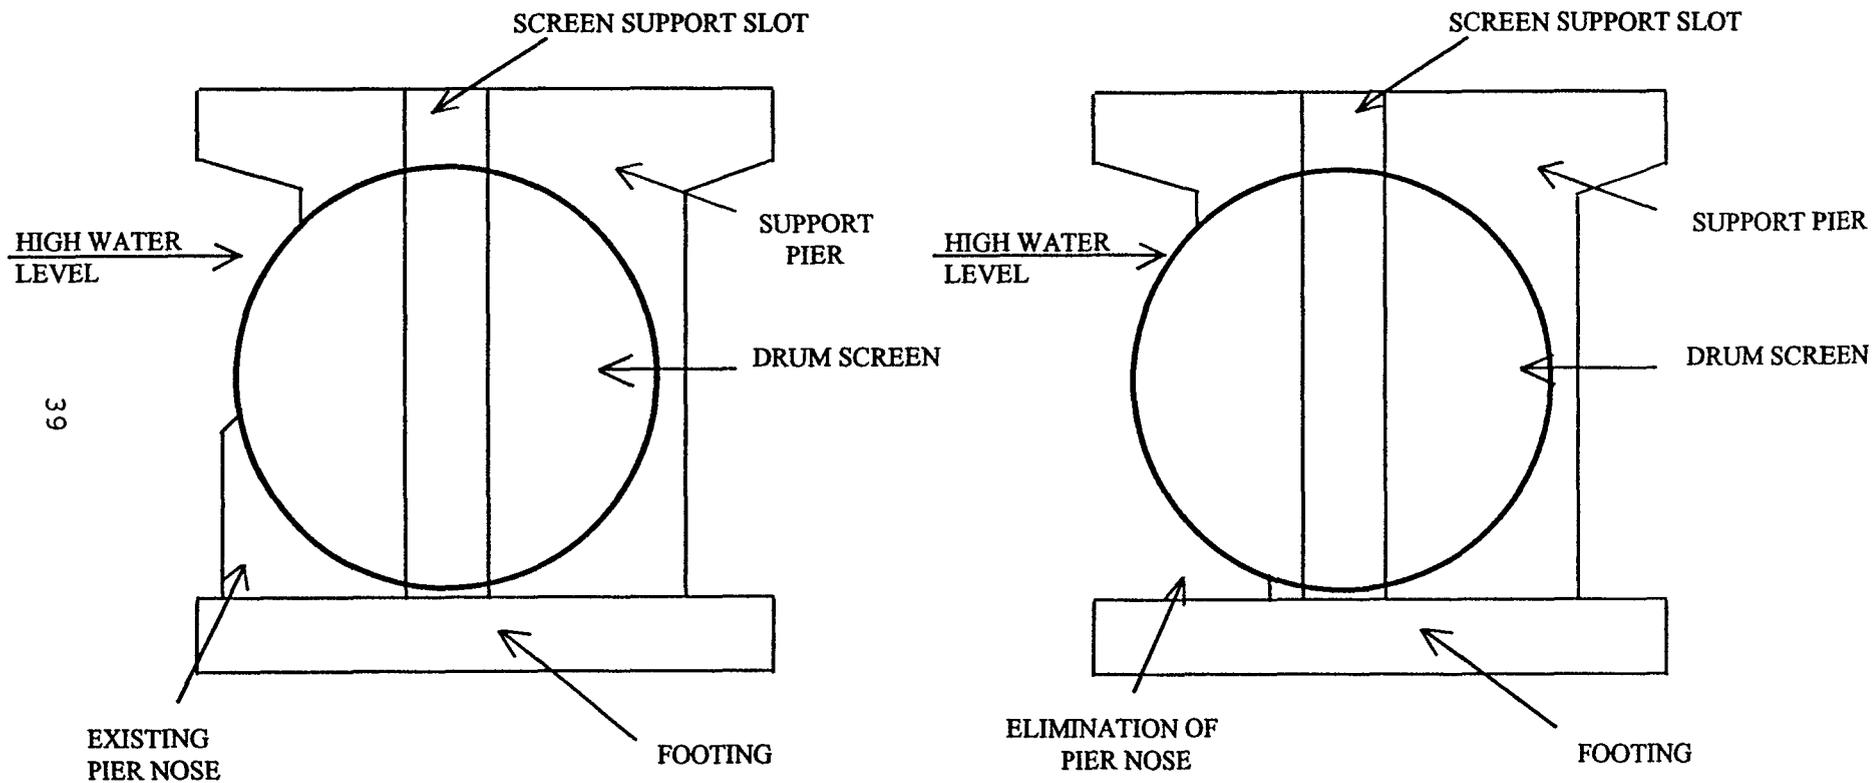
Cross-sectional profile of Woodbridge Irrigation District fish screen concrete support pier showing existing condition (left) and recommended modification to eliminate pier nose (right).
